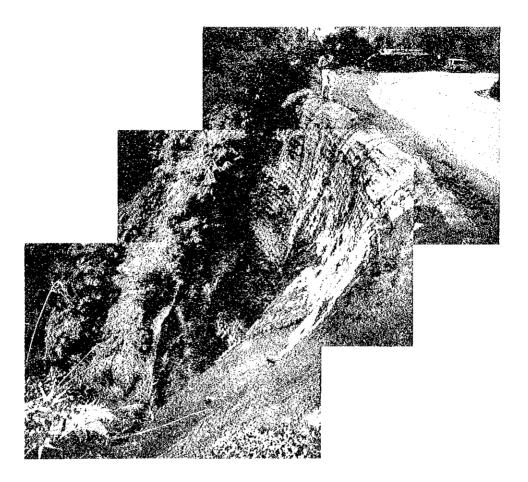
Soil Nail and Reinforced Shotcrete
